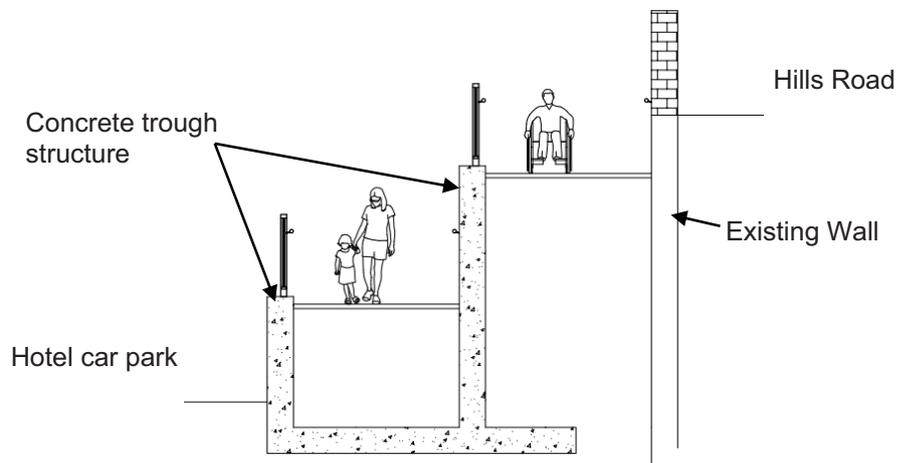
Potential concrete trough retaining wall for ramp along Hills Road
